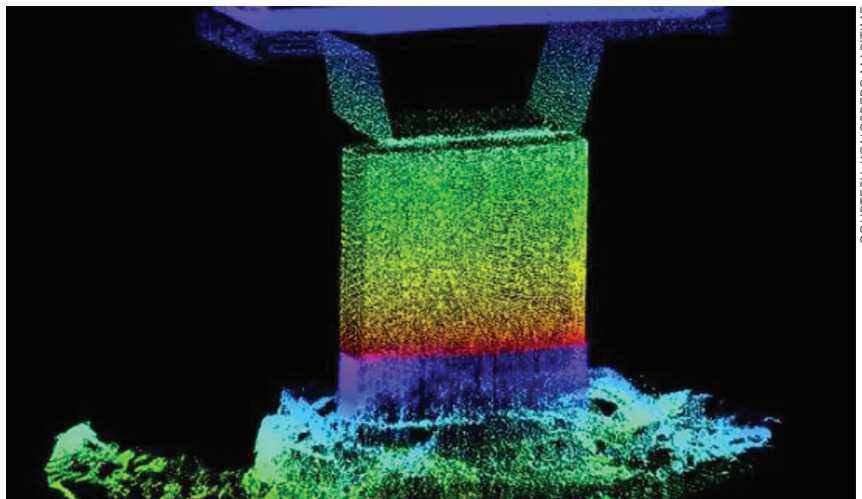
Multibeam image of bridge pier, showing bottom topography.
